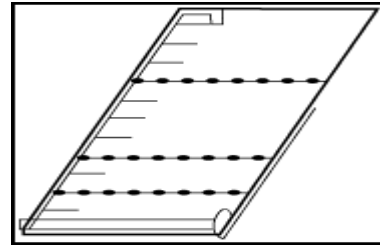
d Geogrid used to reinforce the steep embankment
